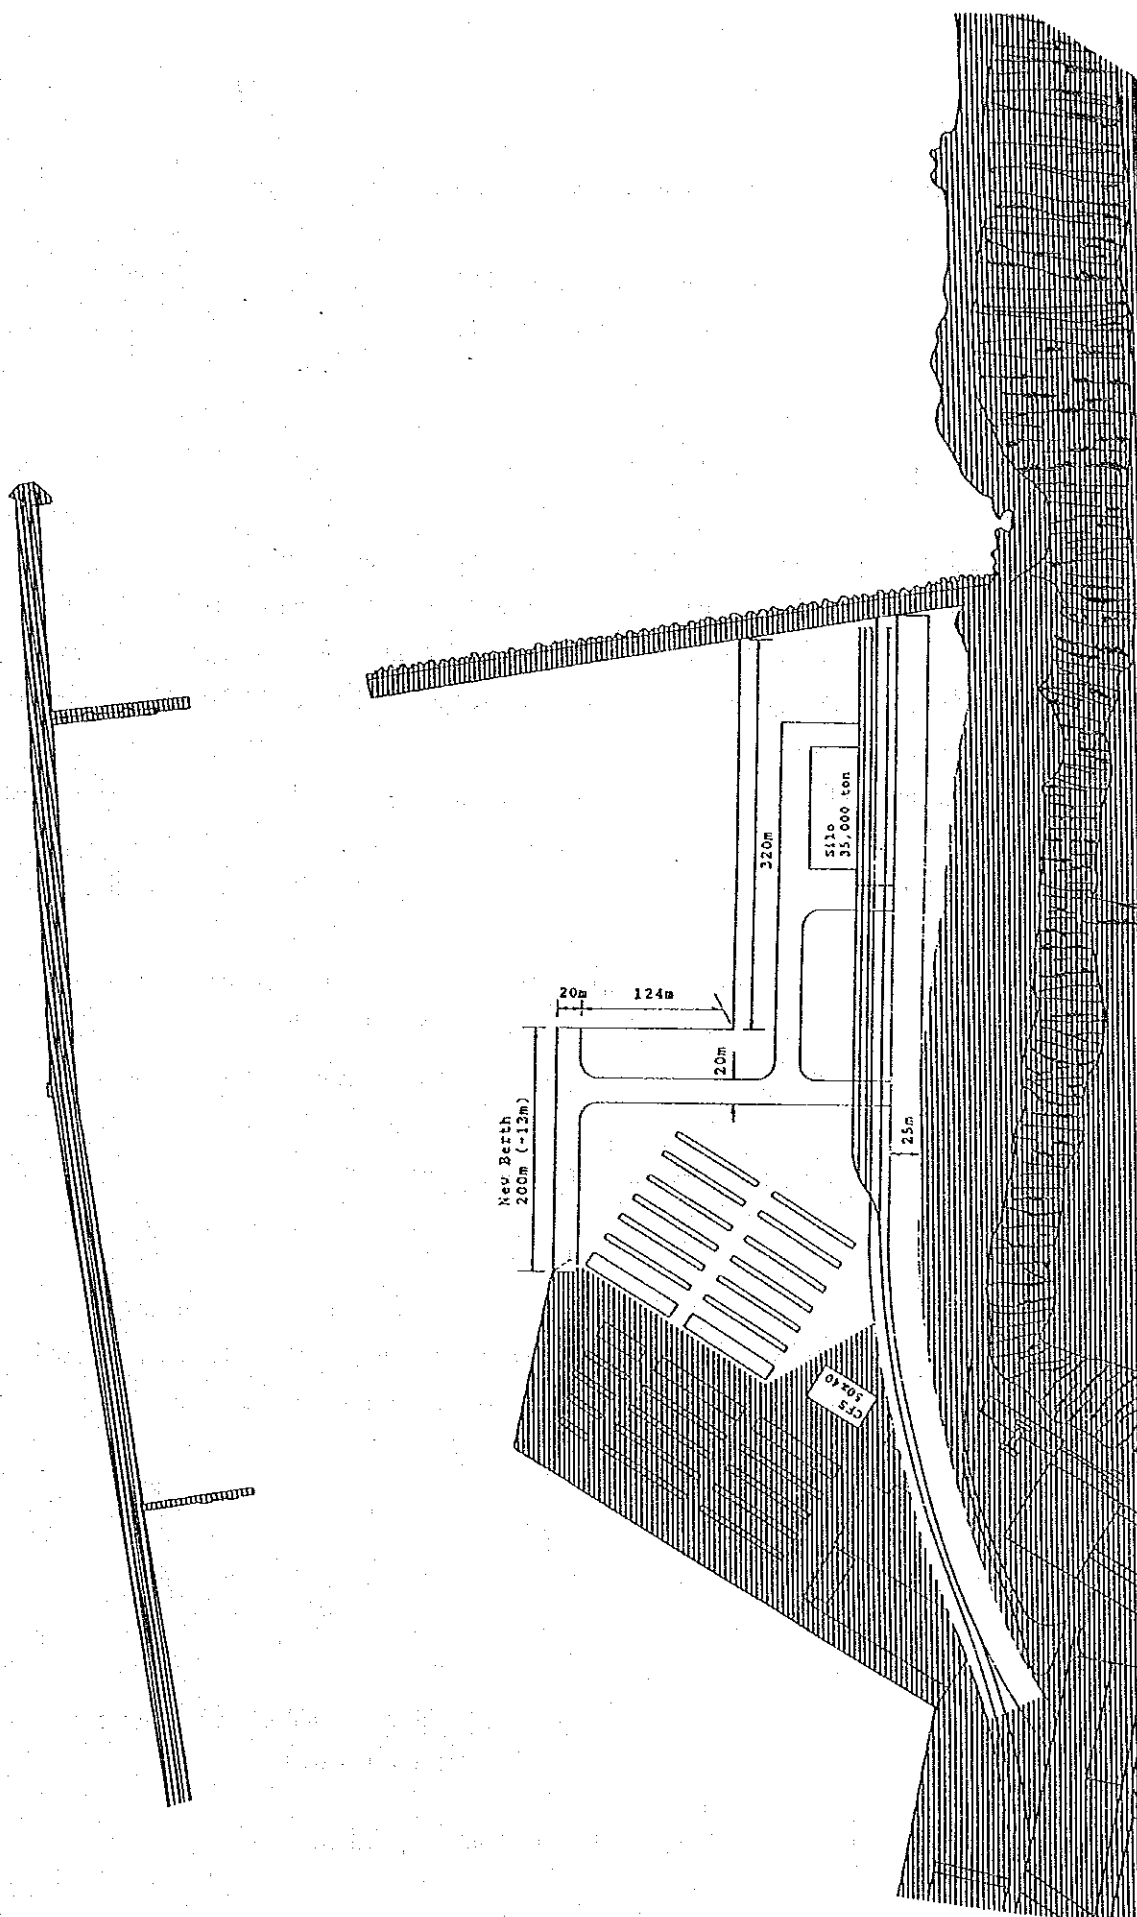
The Layout of the New Facilities in the Short-Term Plan
